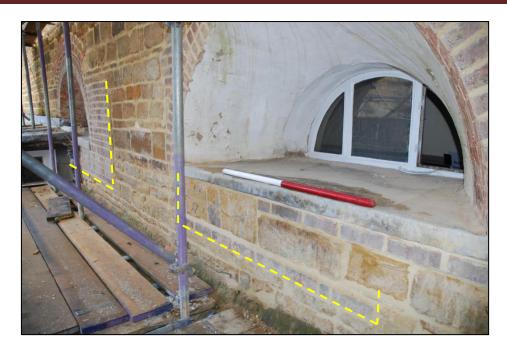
Two courtyard-facing lunettes replaced earlier stone-mullioned windows (dashed), view looking northeast; Scale 1m
